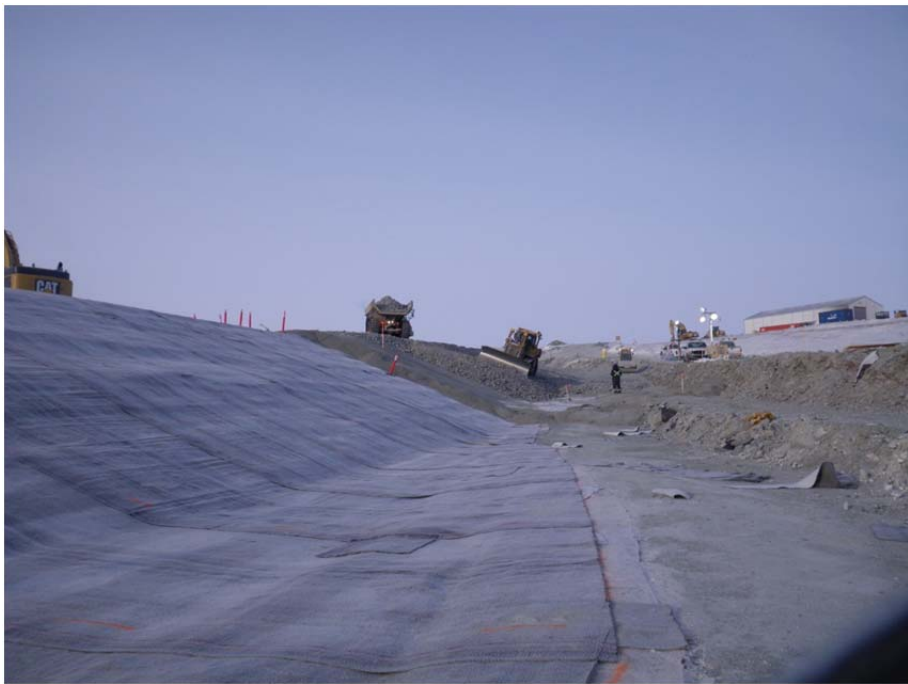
Progress photo of North Dam from photo point 2. Looking north west.
